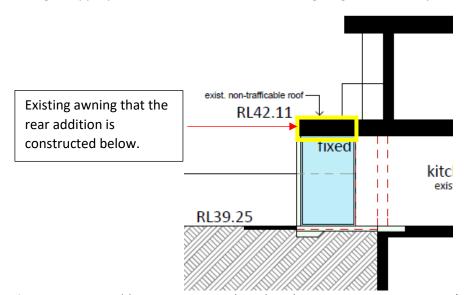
Rear addition constructed under the existing rear awning. (Source: P & S Design and Construction Pty Ltd, 2022).
